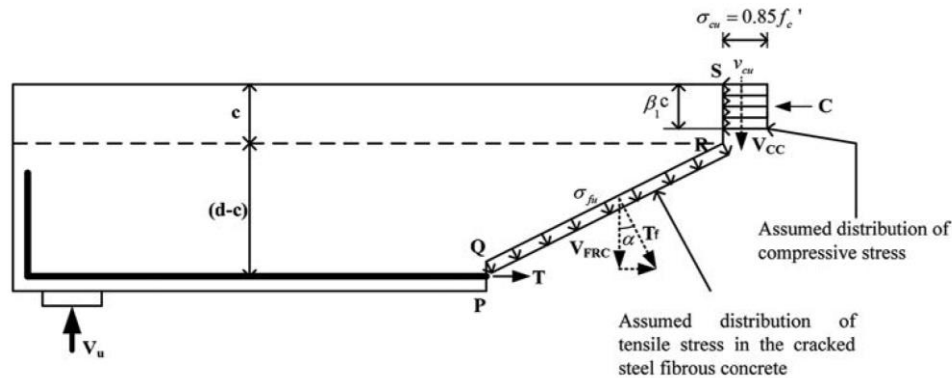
Assumed stresses of SFRC beam failing in diagonal tension (Singh and Jain, 2014).
